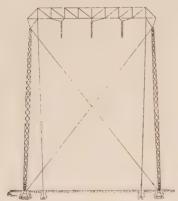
Front Elevation, 220-Kv. Single-Circuit Post Type Tower
